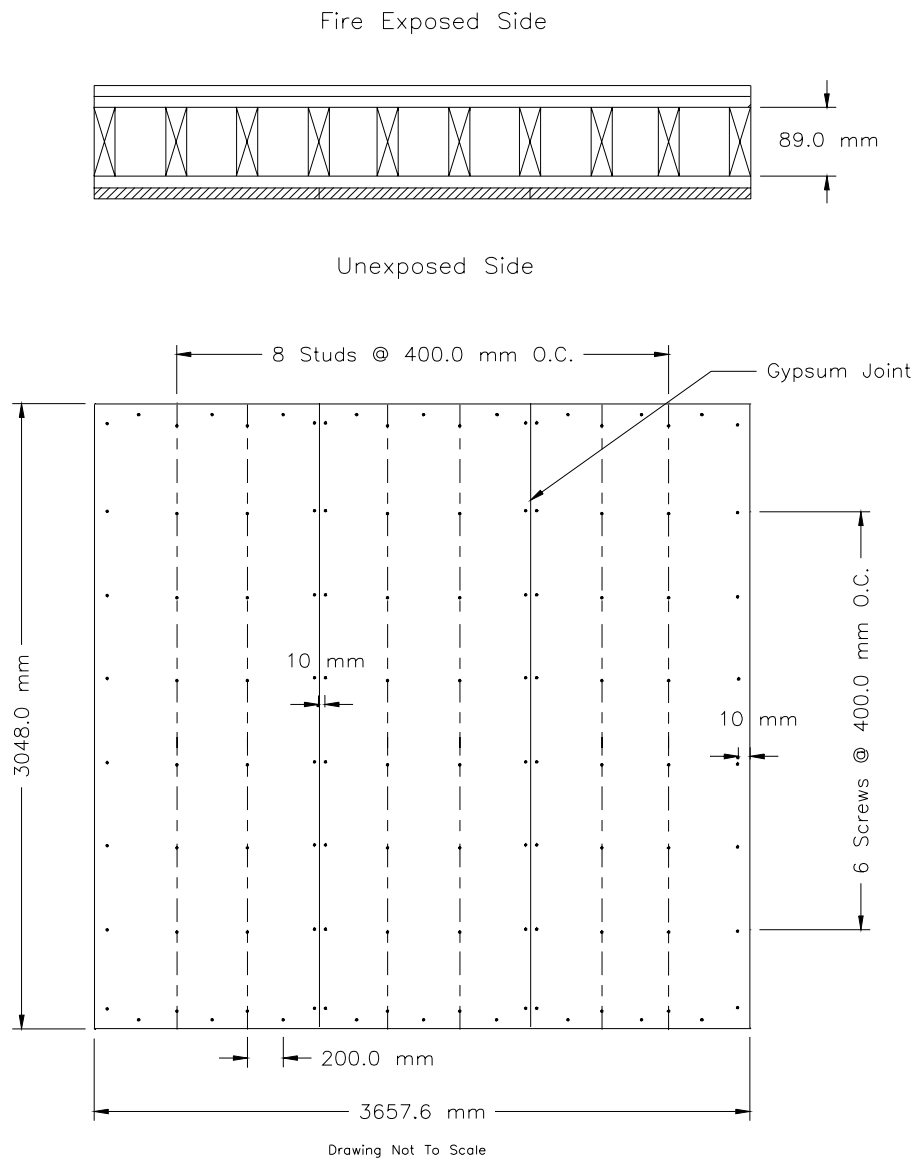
Screw Locations For Wood Stud, 2x2 Gypsum Board Layers, Full-Scale Assembly (Face Layer, Unexposed Side)
